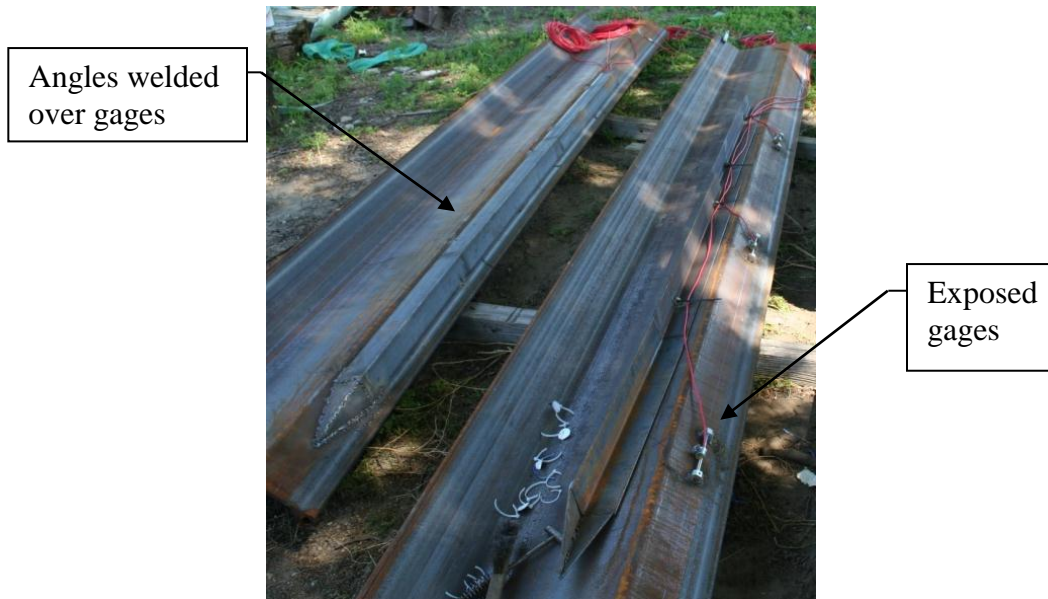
Sheet pile instrumented with vibrating wire strain gages.
